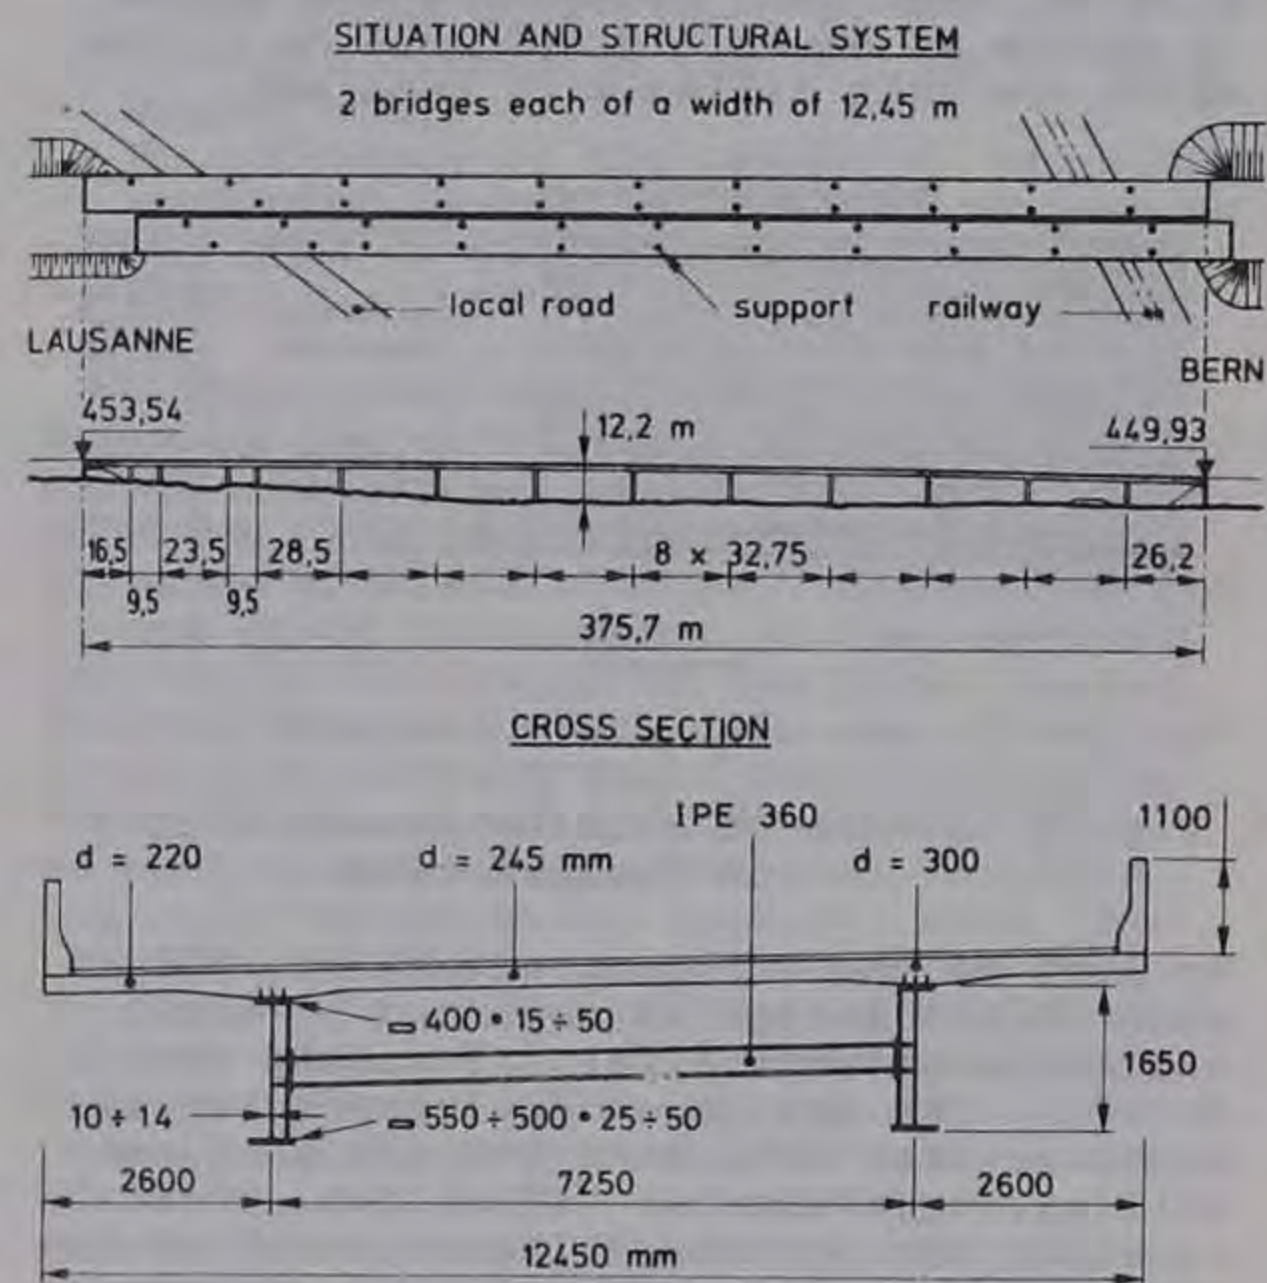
Structural System and Cross-Section of the "Viaducs du Chene"
